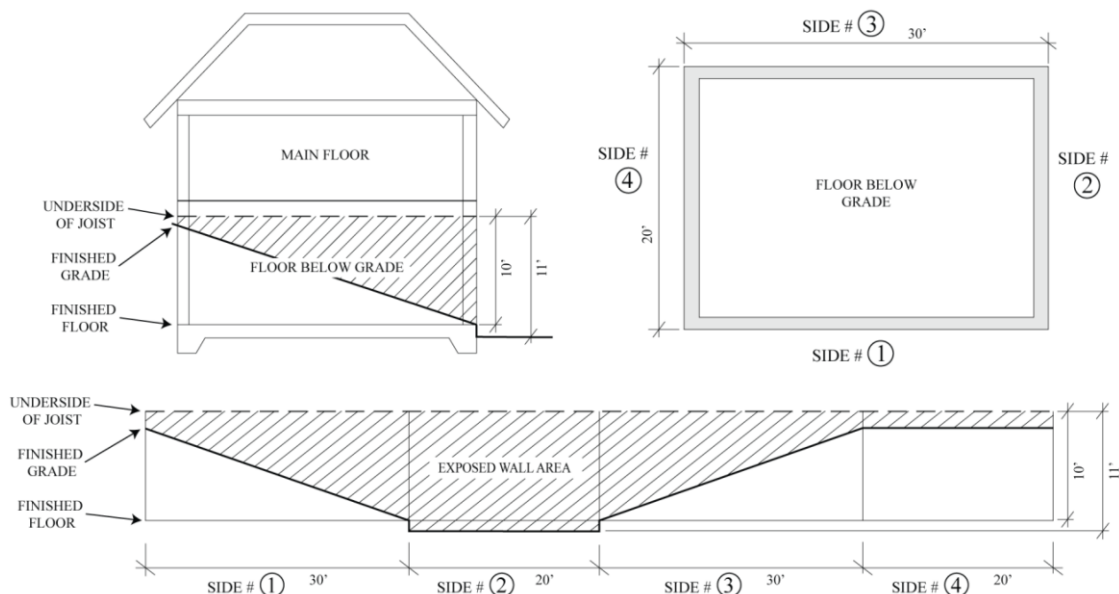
Illustrative example for calculating the floor below grade adjustment
